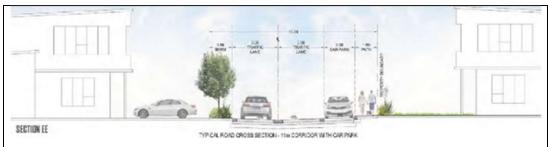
Loop Road Cross-Section with Parking (Prepared by Development Nous)
